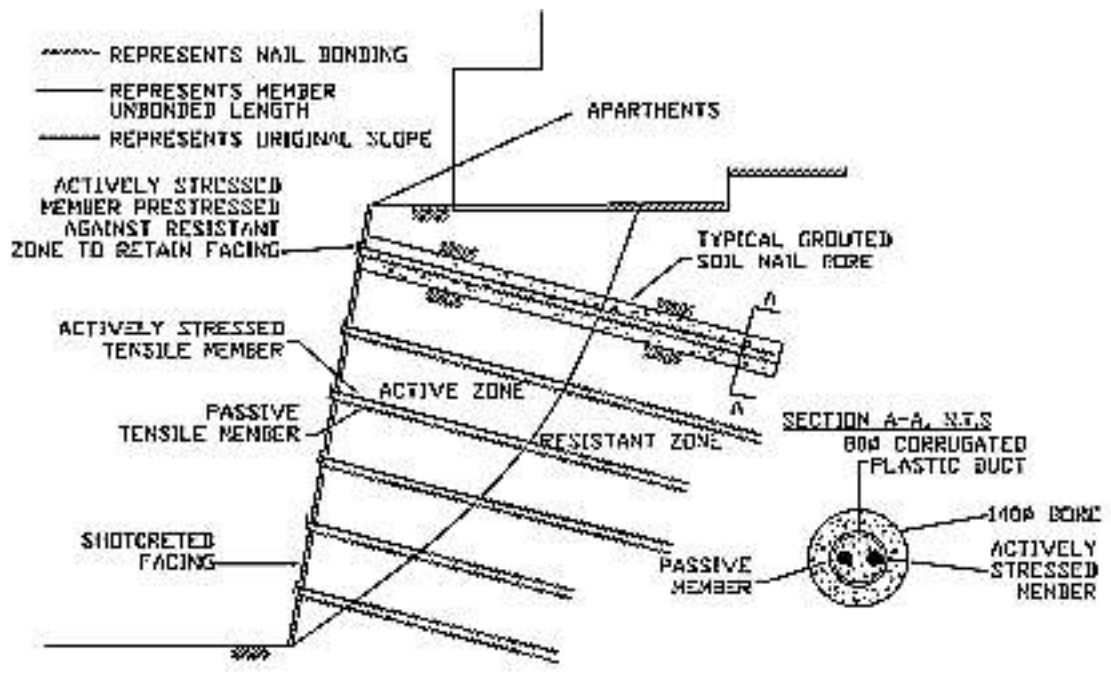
Steep slope stabilisation with actively stressed soil nails, designed for dual purpose usage
